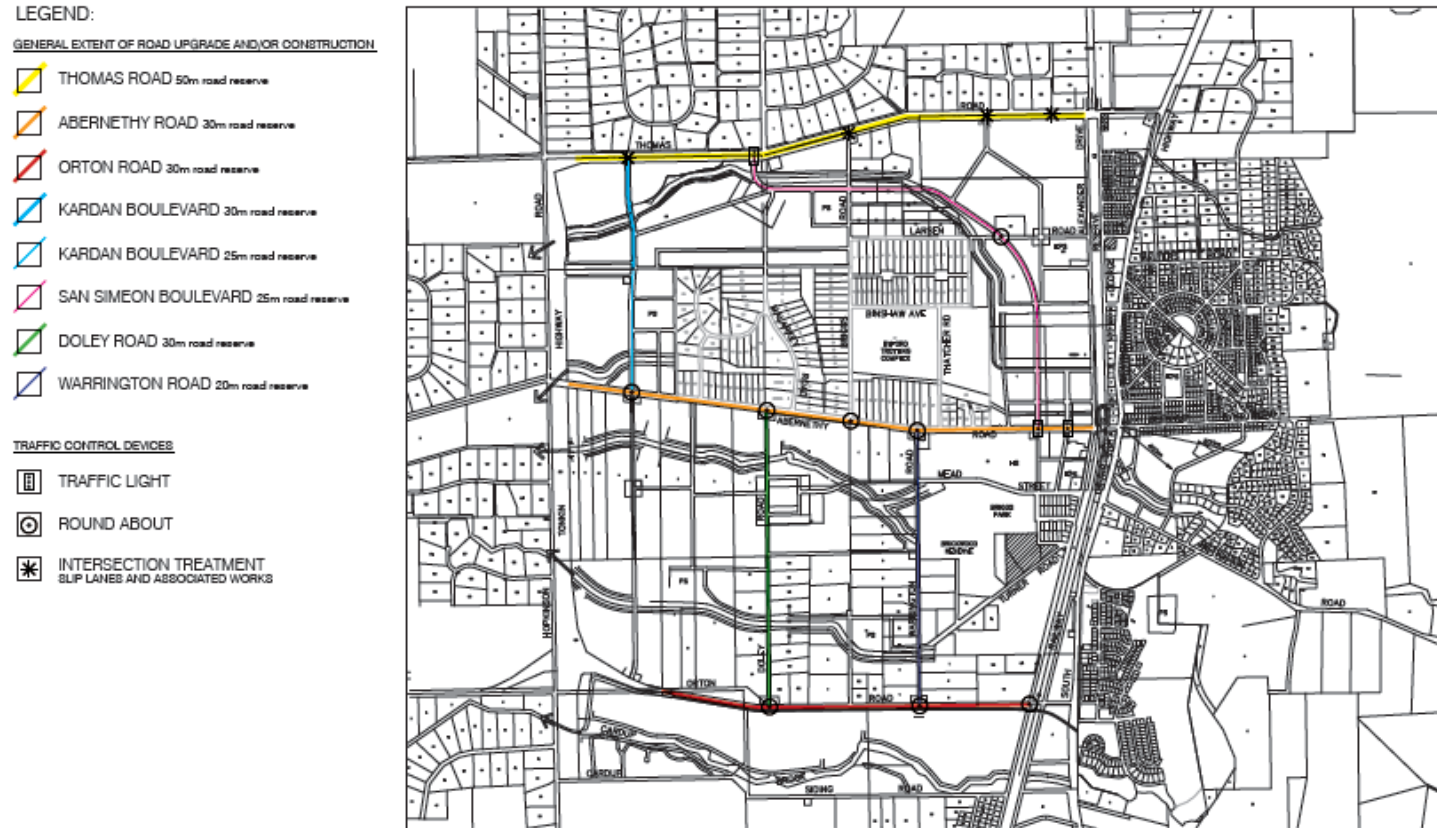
ROADS TO BE UPGRADED AND/OR CONSTRUCTED THROUGH THE
